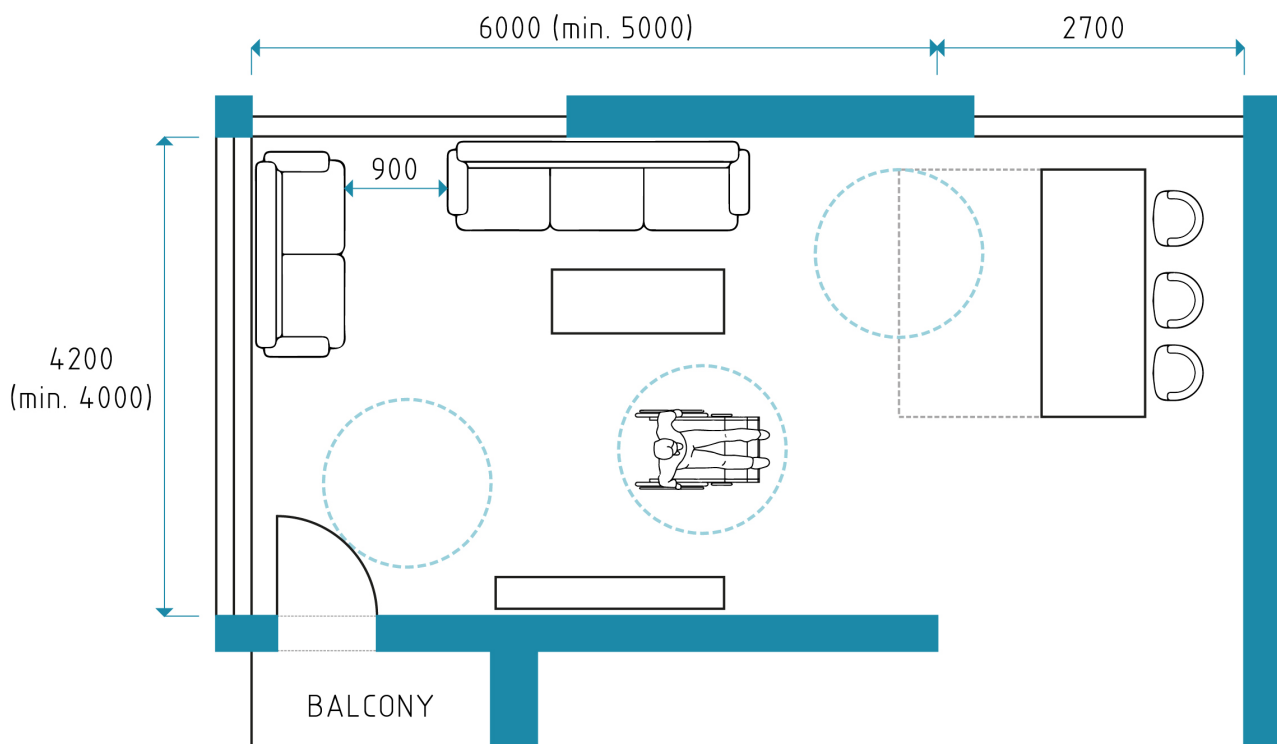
Illustrative floor plan of an accessible living room (Lacho, Suláková)
